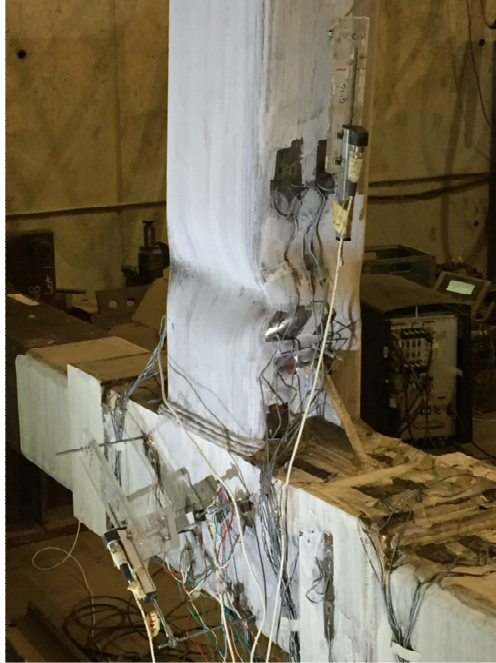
Local Buckling of Collar Connection with Stiffeners at the First 0.06 rad. Cycle
